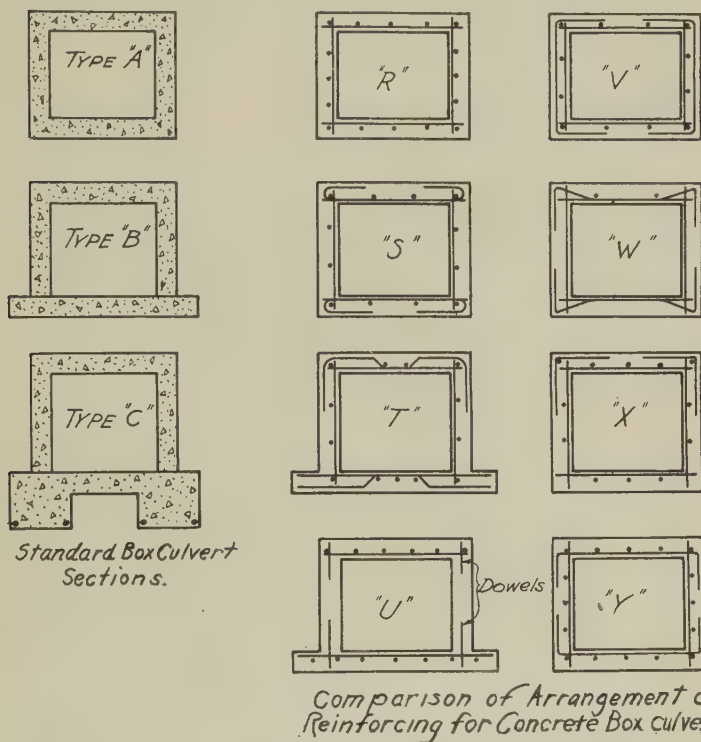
COMPARISON OF ARRANGEMENTS OF REINFORCEMENT FOR CONCRETE BOX CULVERTS.
